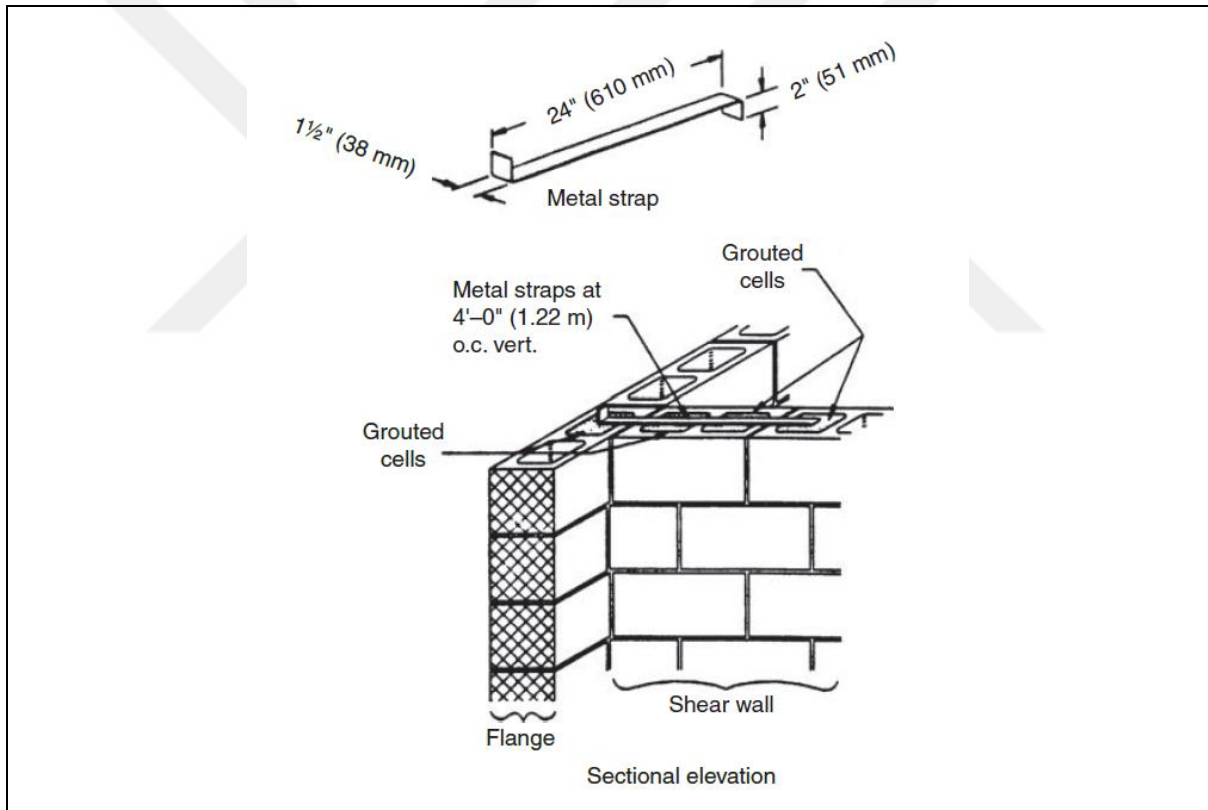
Metal Straps and Grouting at Wall Intersections.
